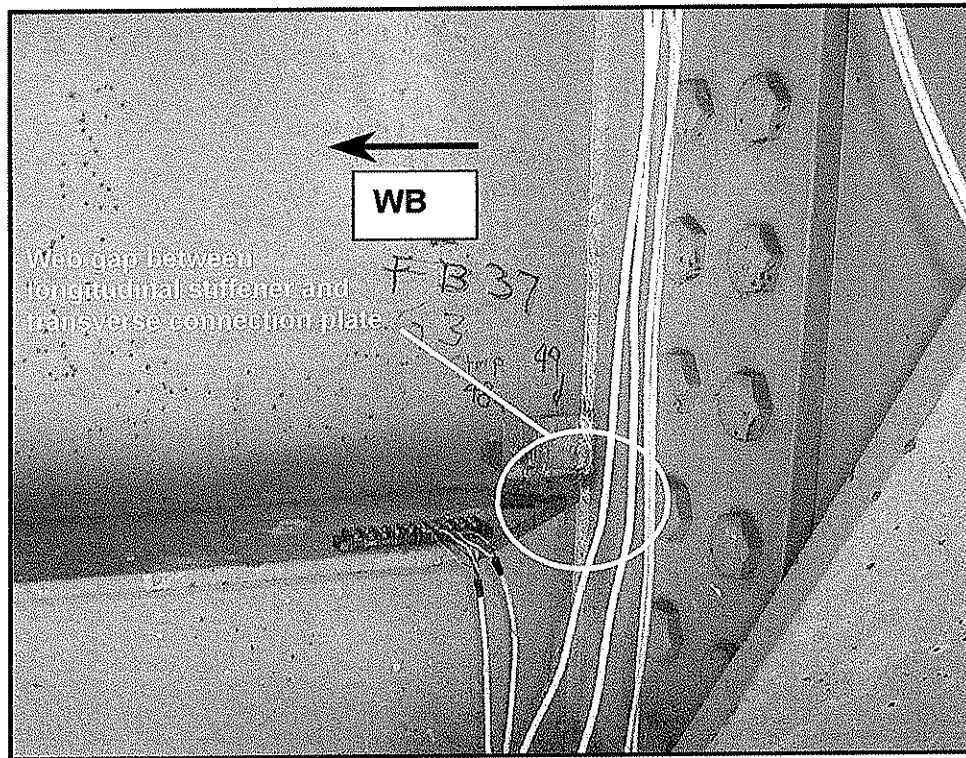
Location of web gap between longitudinal stiffener termination and transverse connection plate
